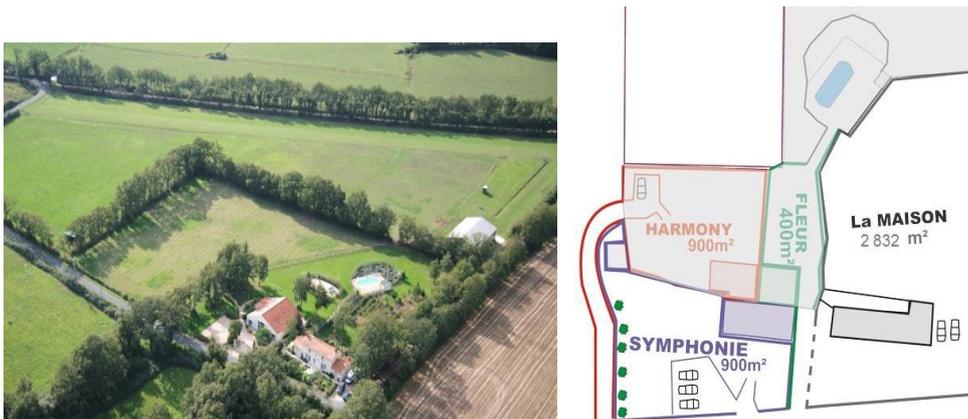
Dinair Village Site Plan (dinair-village.com, no date b)
